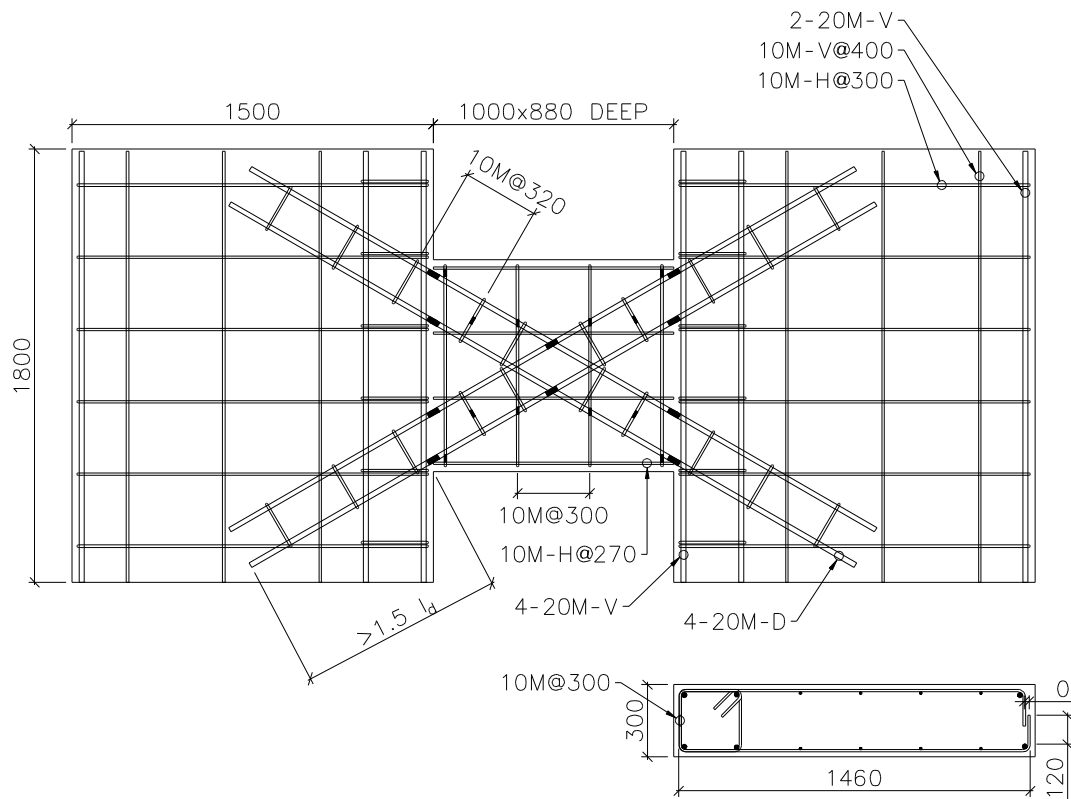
Detailing of specimen CC-16d<sub>b</sub>
